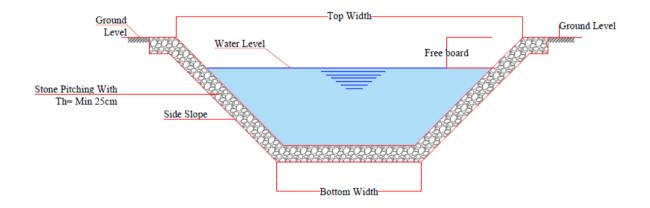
Typical Cross-Section for a Grouted stone-pitching Lined Channel (Bed and Sides) (Source: Consultant, 2022)
